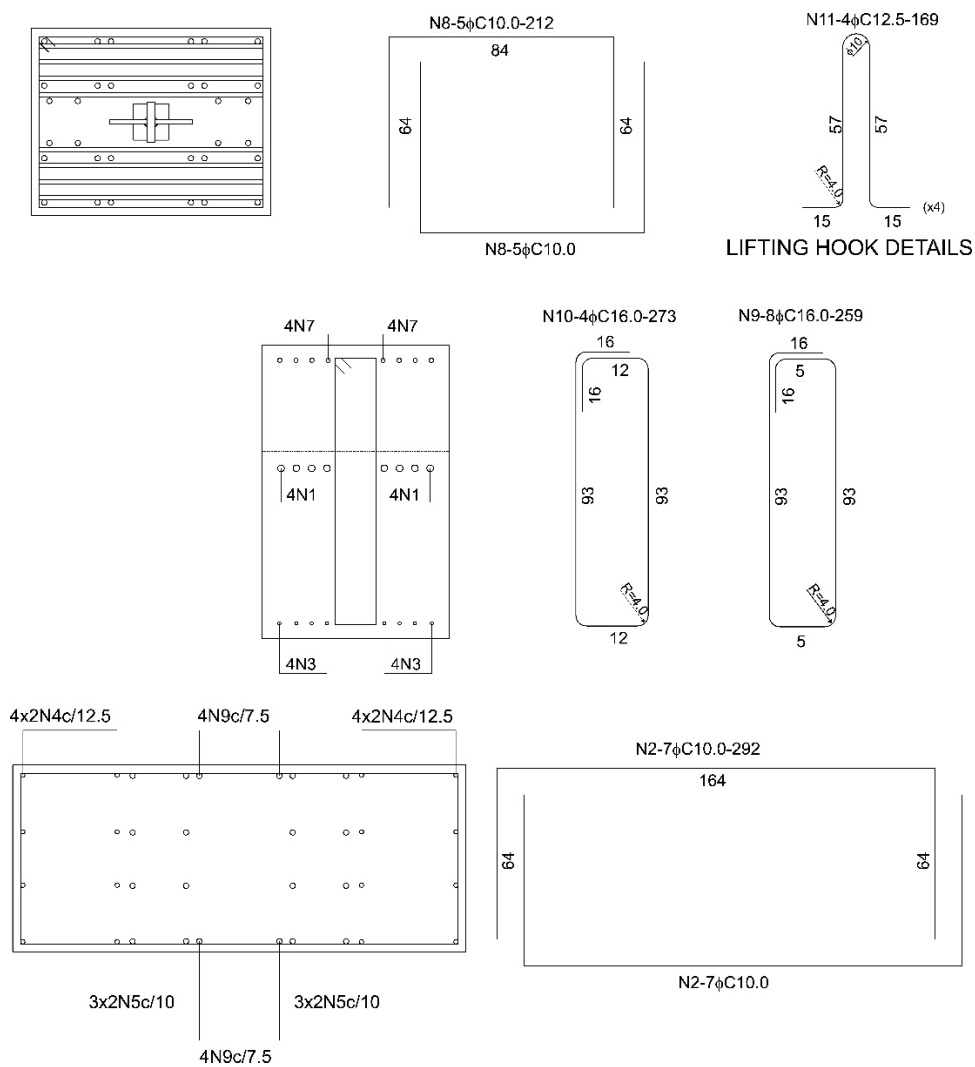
Reinforcement of the concrete block - Detailing (Part 2, dimensions in cm).
